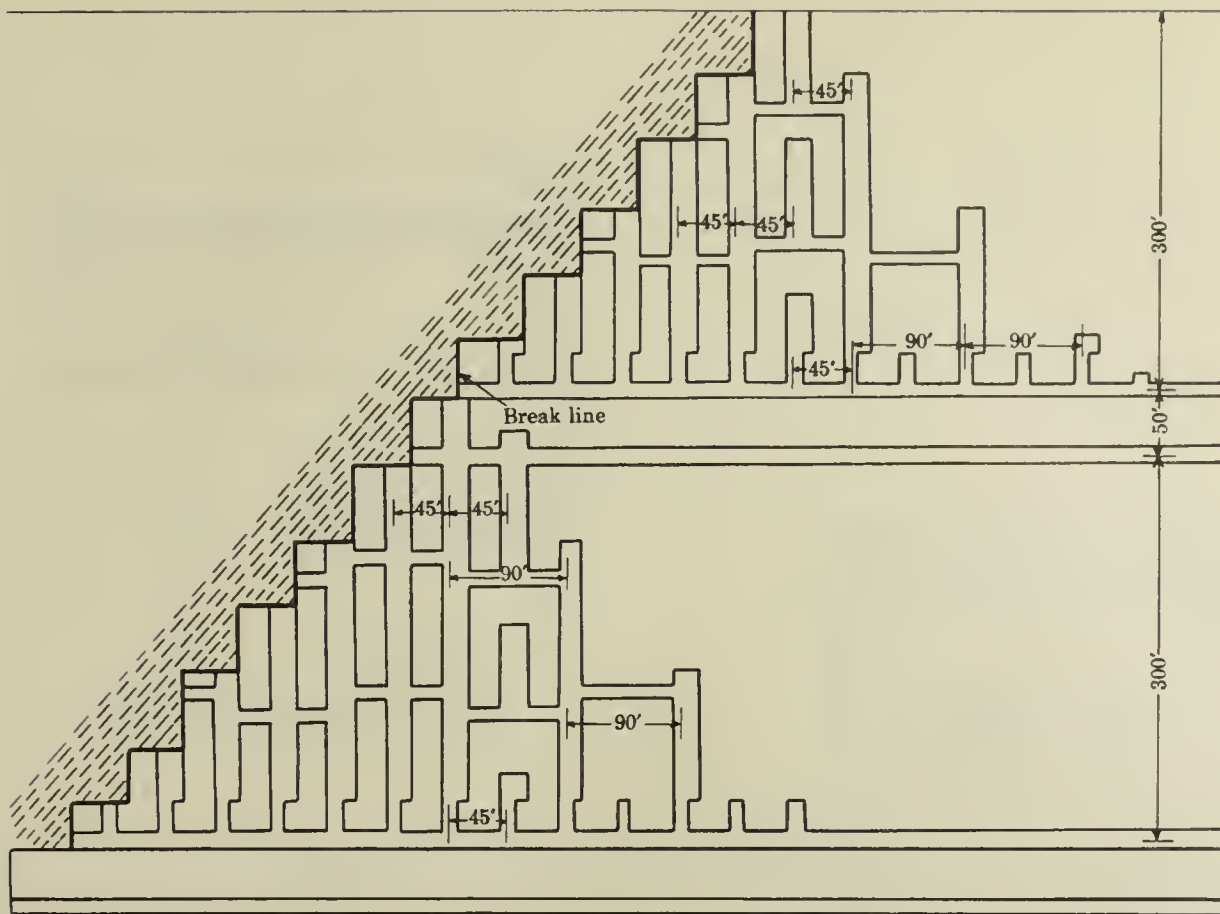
METHOD OF TURNING ROOMS ON 90-FOOT CENTERS
